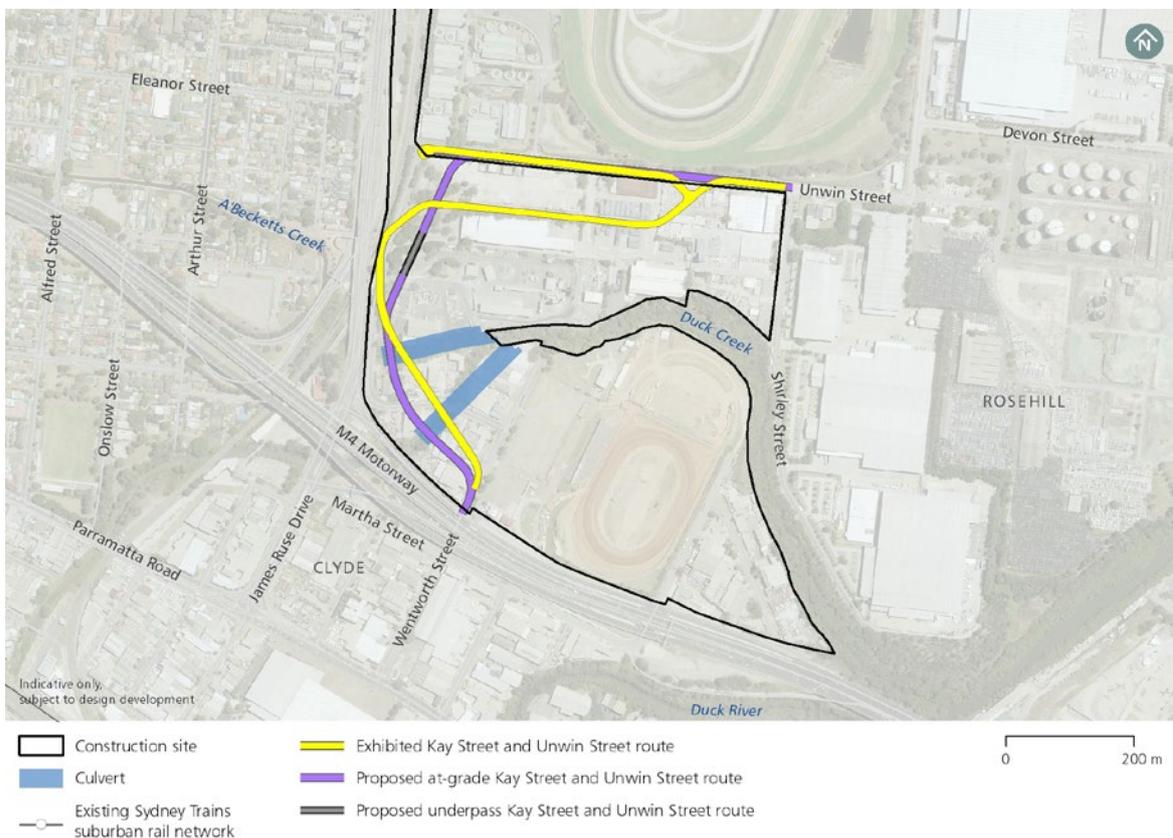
Proposed amendment to Kay Street and Unwin Street route and creek alignment works
